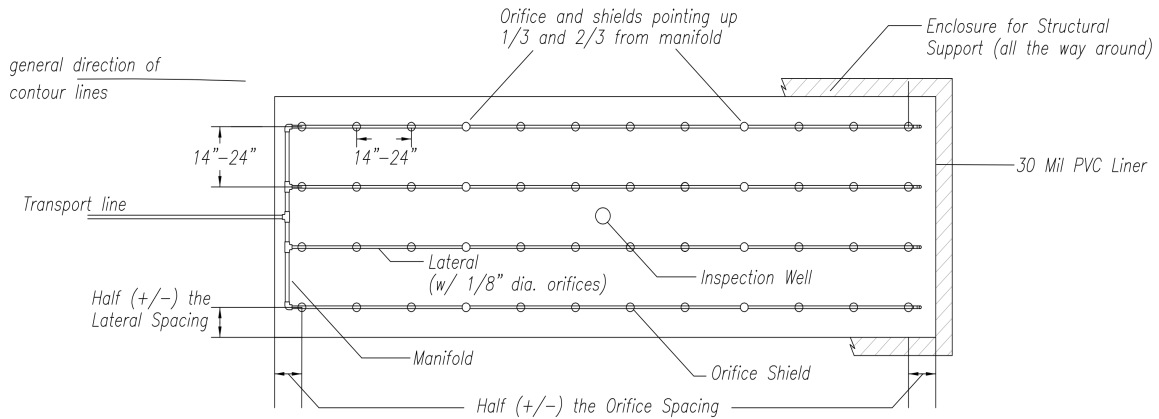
TYPICAL BOTTOMLESS SAND FILTER (TOP VIEW)
